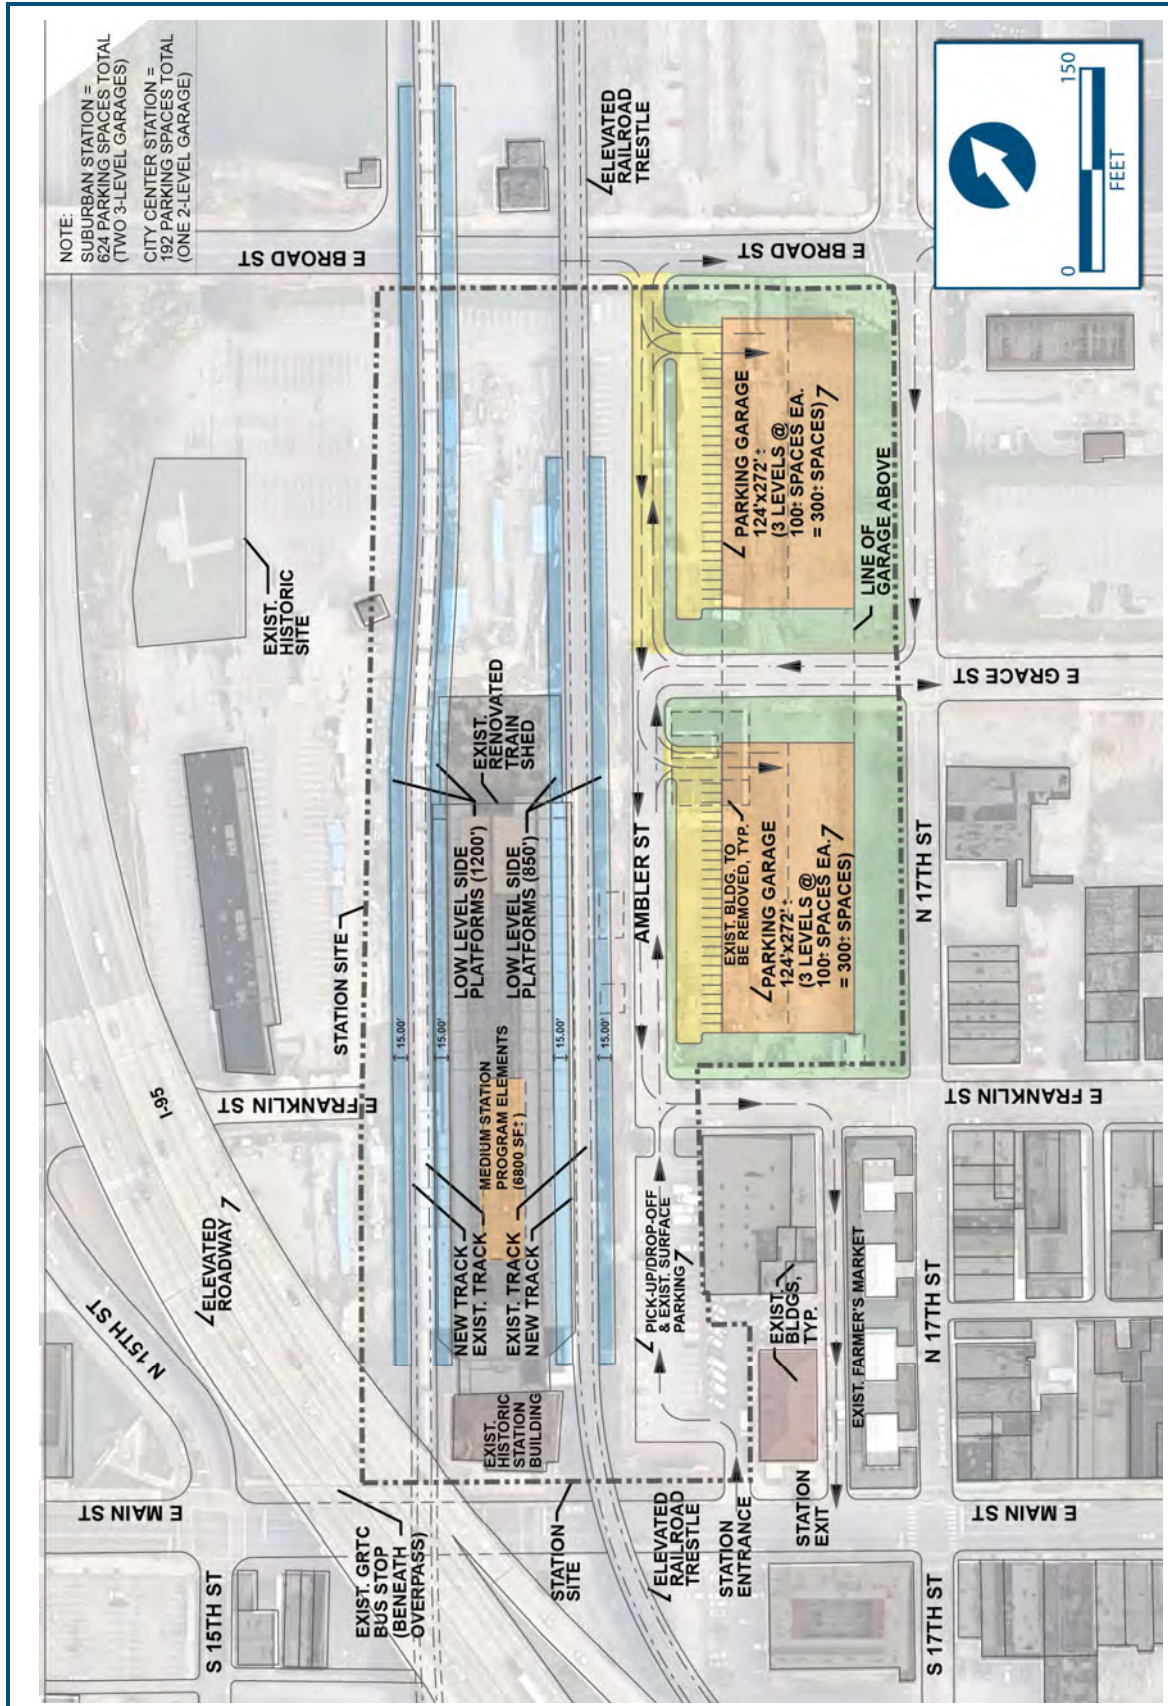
Main Street Station Improvements for Build Alternative 6D
